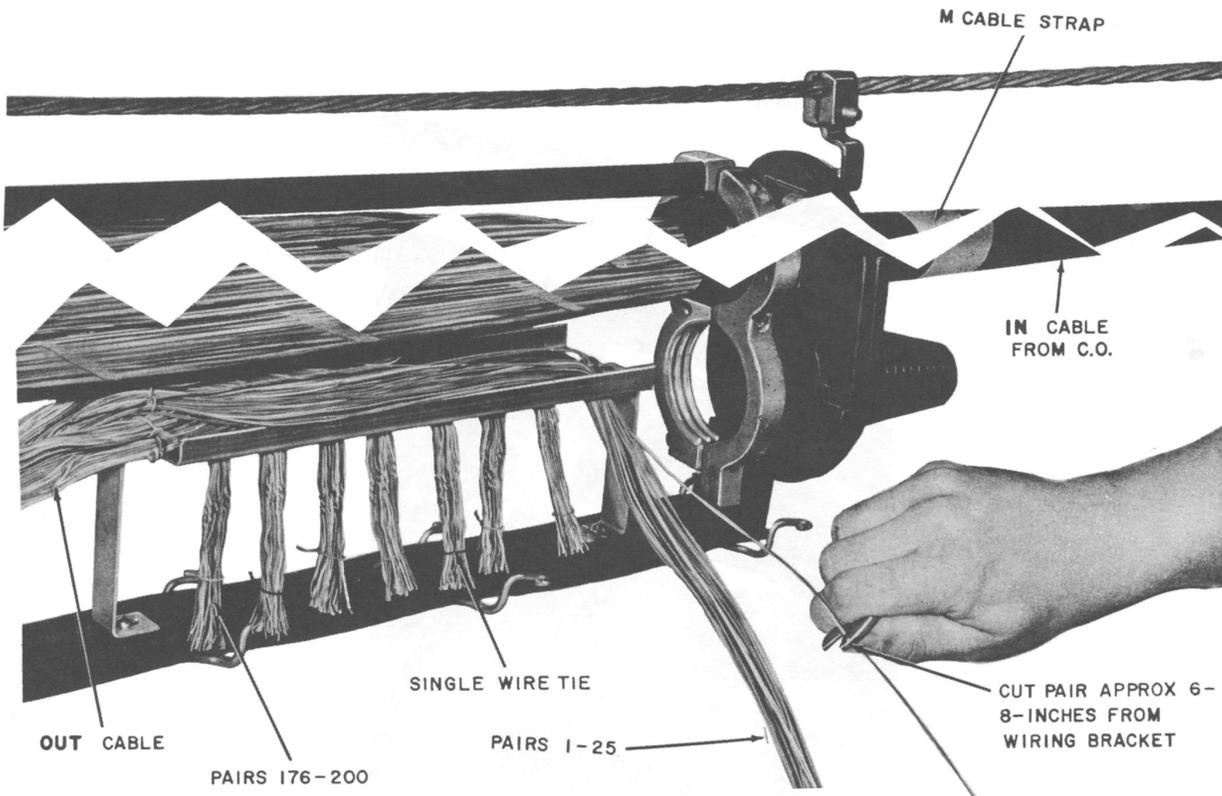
Cutting *OUT* Cable Pair to Length—Rear View
